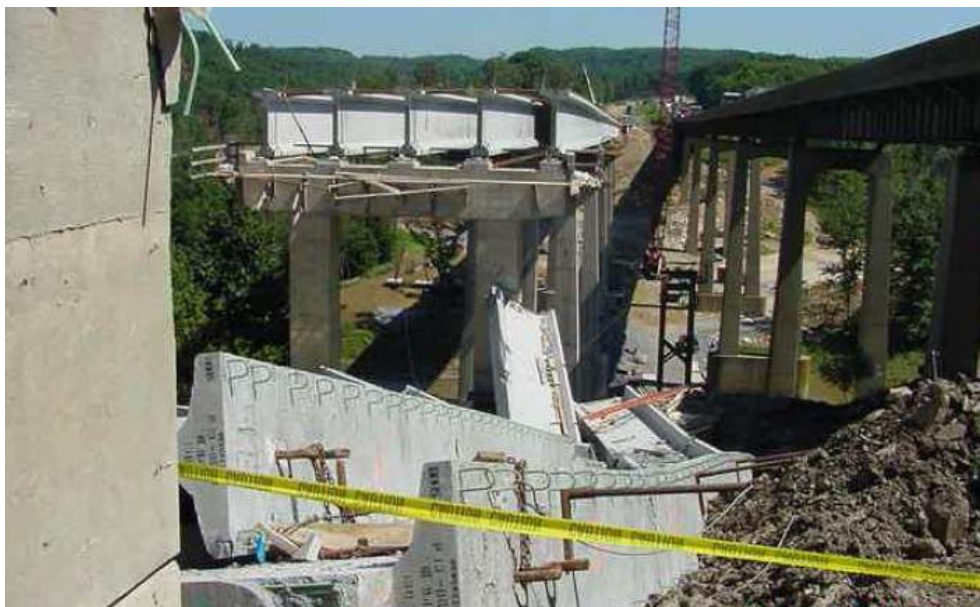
6. Stability failure of precast prestressed concrete girders I-80 in Pennsylvania. ^[10]
